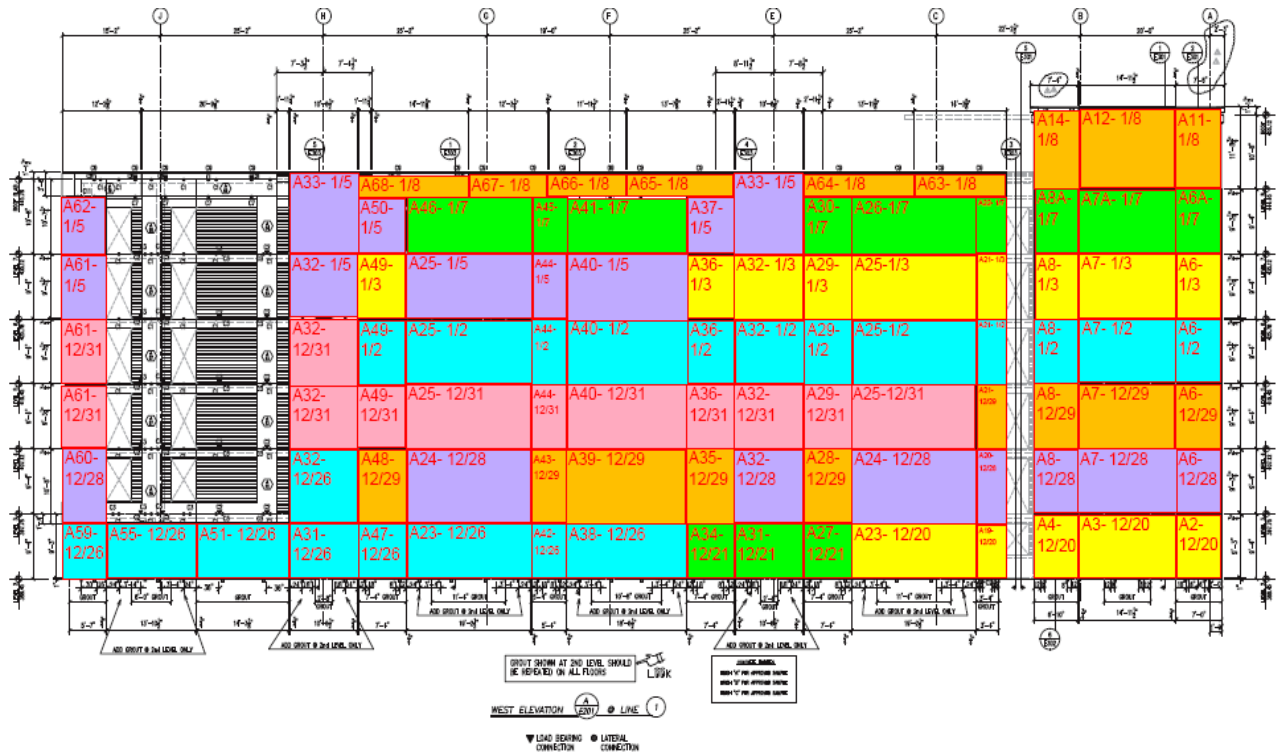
West Elevation Precast Panel Installation Tracking, Image Courtesy of Grunley Construction Company
